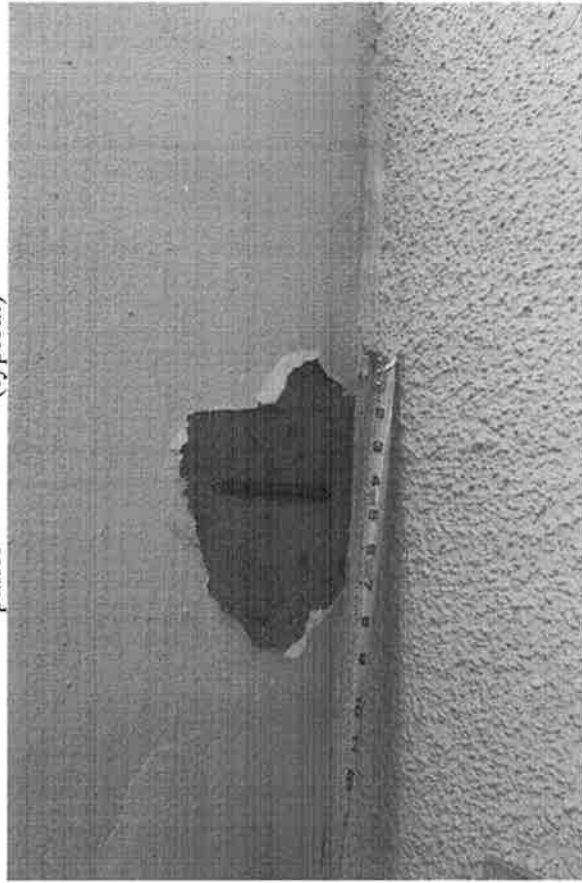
Isolated spall on surface of hollow core concrete panel at unit 501 (typical)
